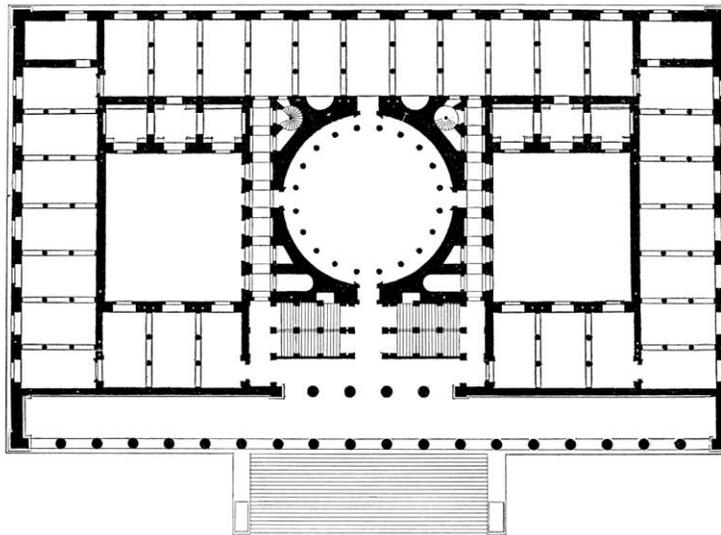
Karl Friedrich Schinkel's Altes Museum plan layout (Darragh & Snyder, 1993)
